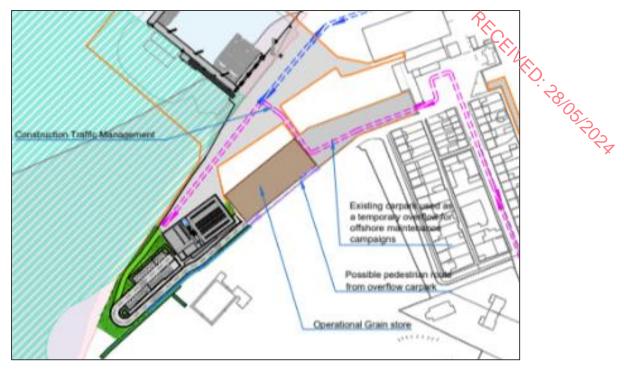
Temporary Access Route north of former Open Hydro building and Building A to carpark.
